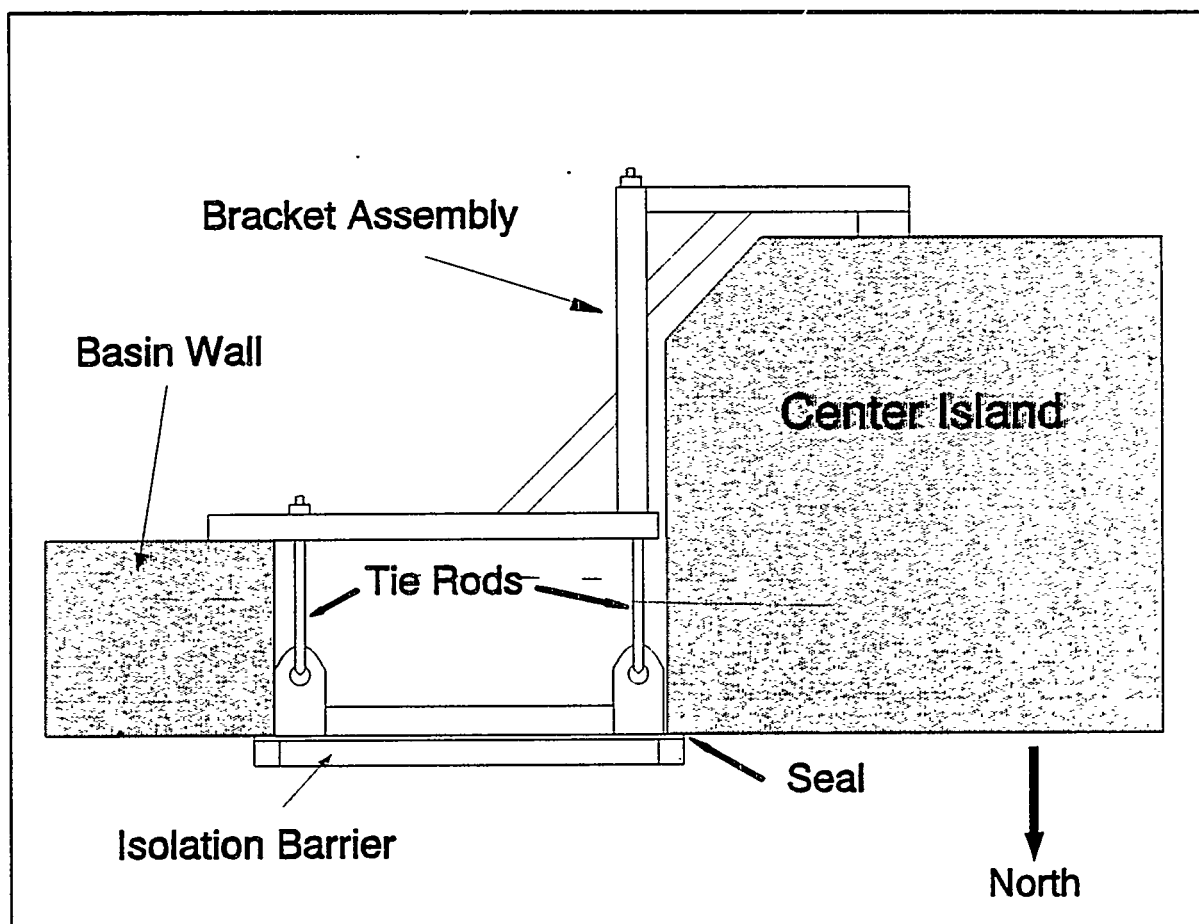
Plan View of Isolation Barrier Door and Support Bracket.
